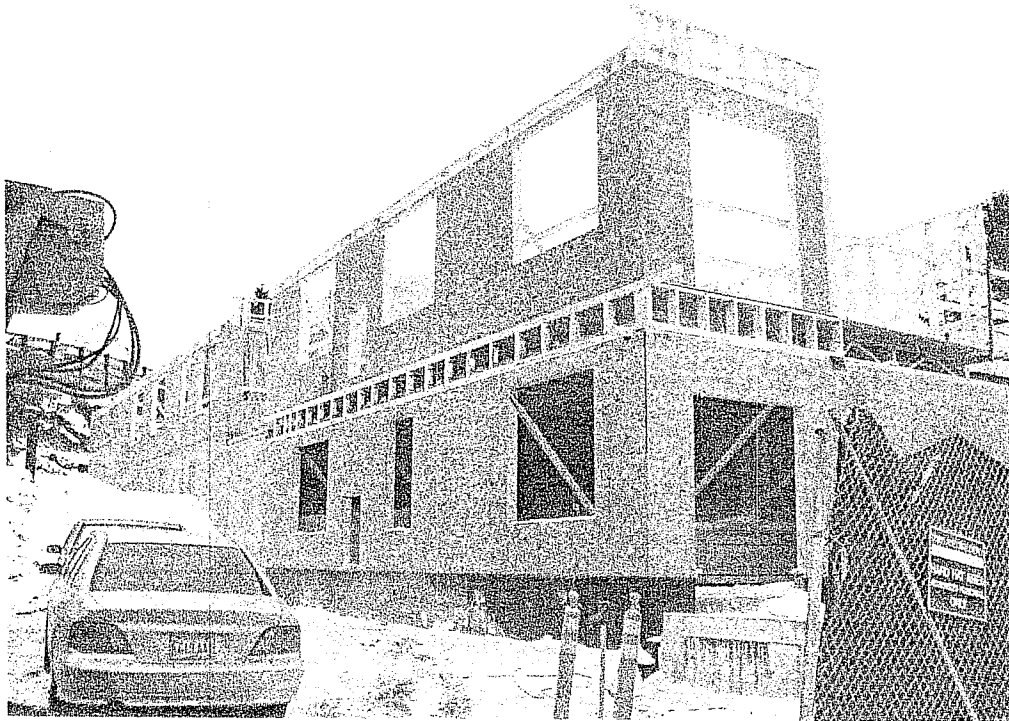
Wood framing construction is in progress at first floor and beginning at second floor.
